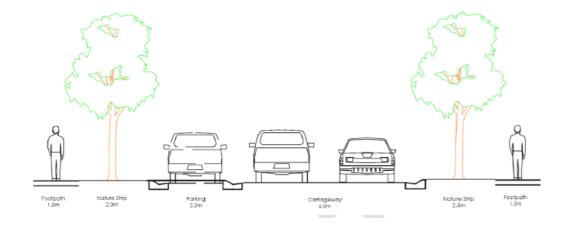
16.5m Road Typical Cross-section (Council Road)
